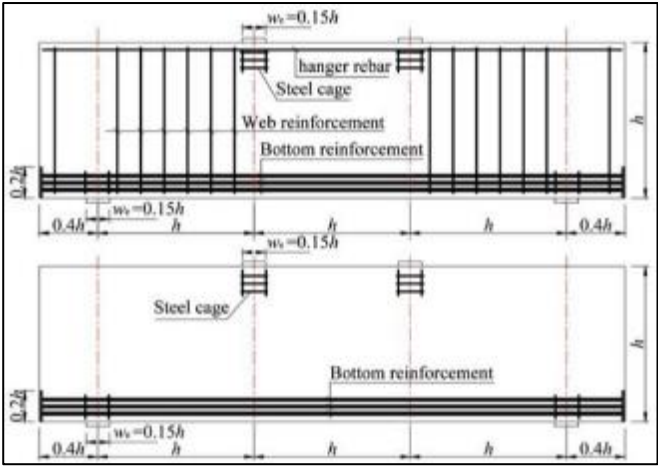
Typical reinforcement layout for specimens with and without web rebars [11]
